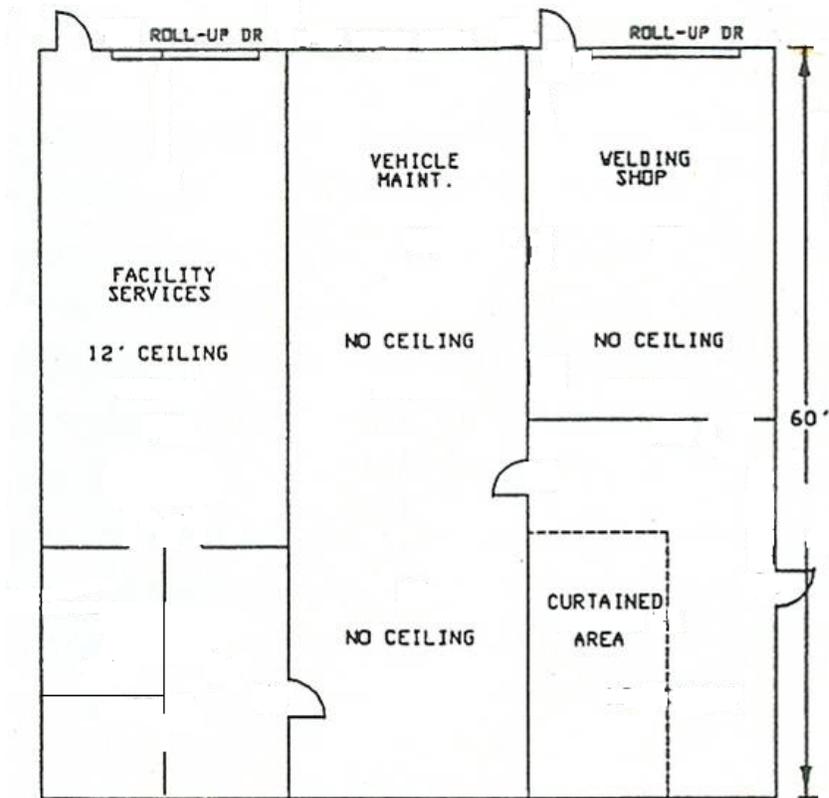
Facility Services/Equipment Maintenance (Building 3) Floor Plan
